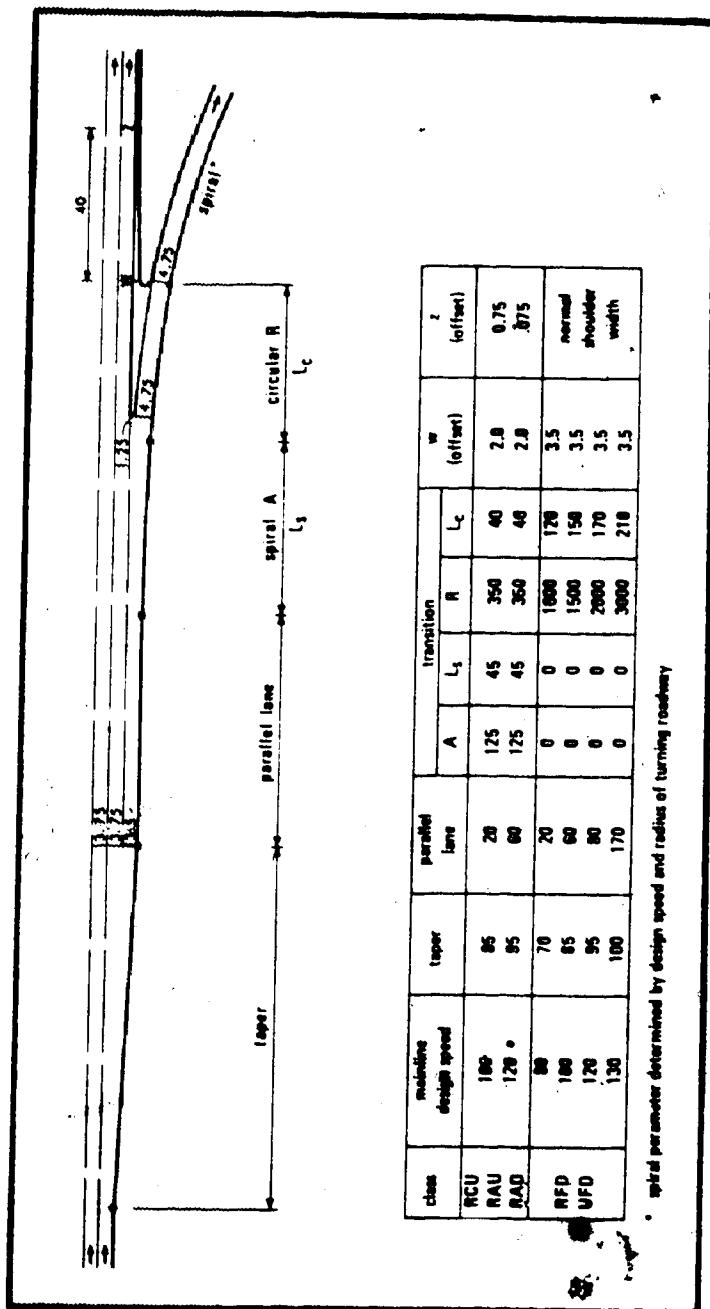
TYPICAL PARALLEL LANE EXIT RAMP-RTAC
